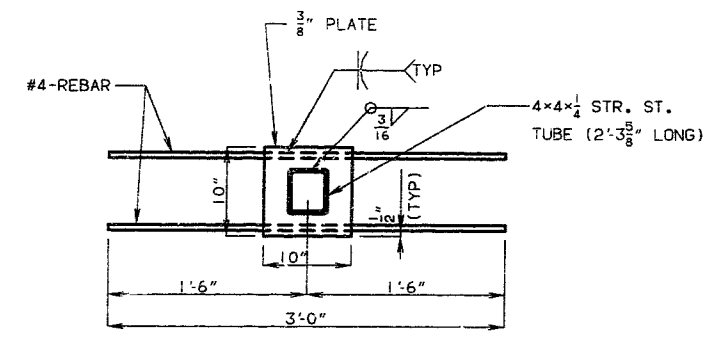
DETAIL OF TRELLIS COLUMN AT OUTSIDE OF WALKWAY
